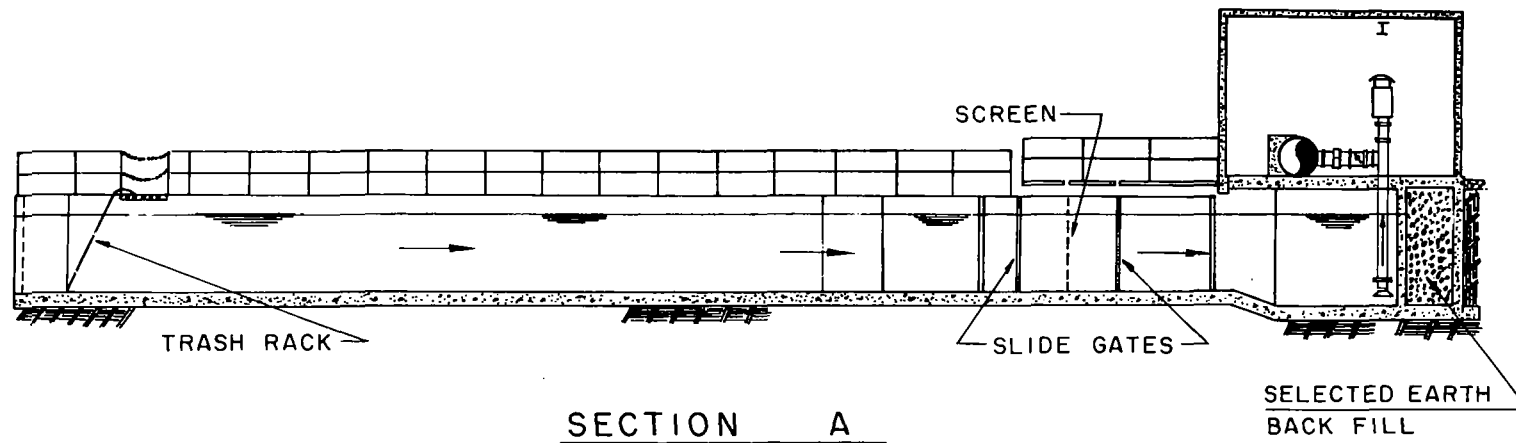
NAVET INTAKE AND PUMP STATION – SECTIONS
